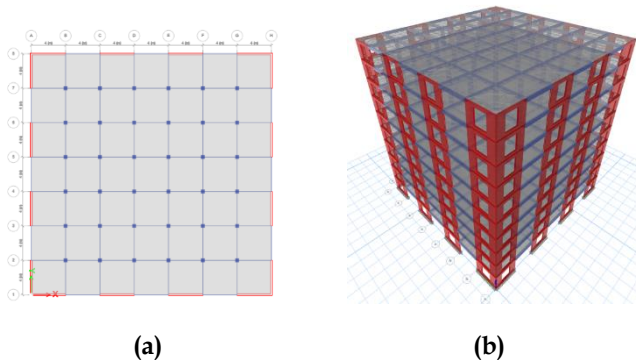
(a) Plan and (b) 3D model of CSW provided alternately
